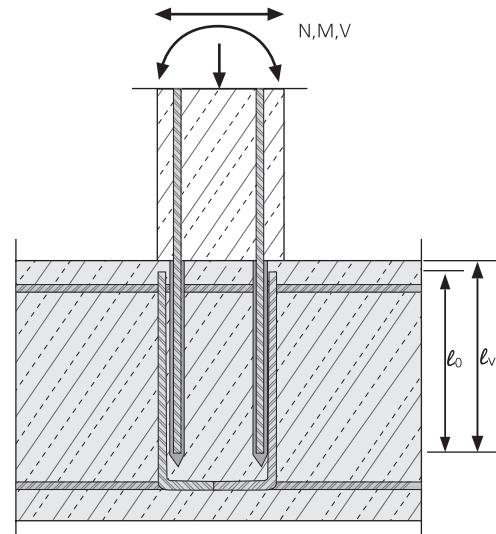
Overlap joint at a foundation of a column or wall where the rebars are stressed in tension
